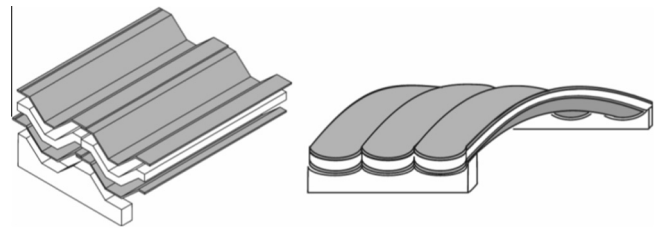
Examples for medium (left) and long (right) span roof construction.
